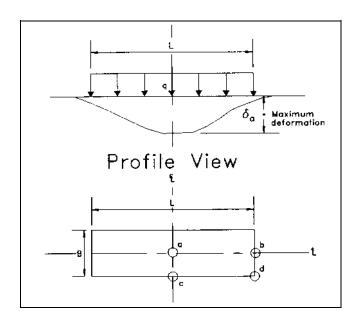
Typical deformation profile under a uniformly loaded, rectangular shaped, flexible foundation
